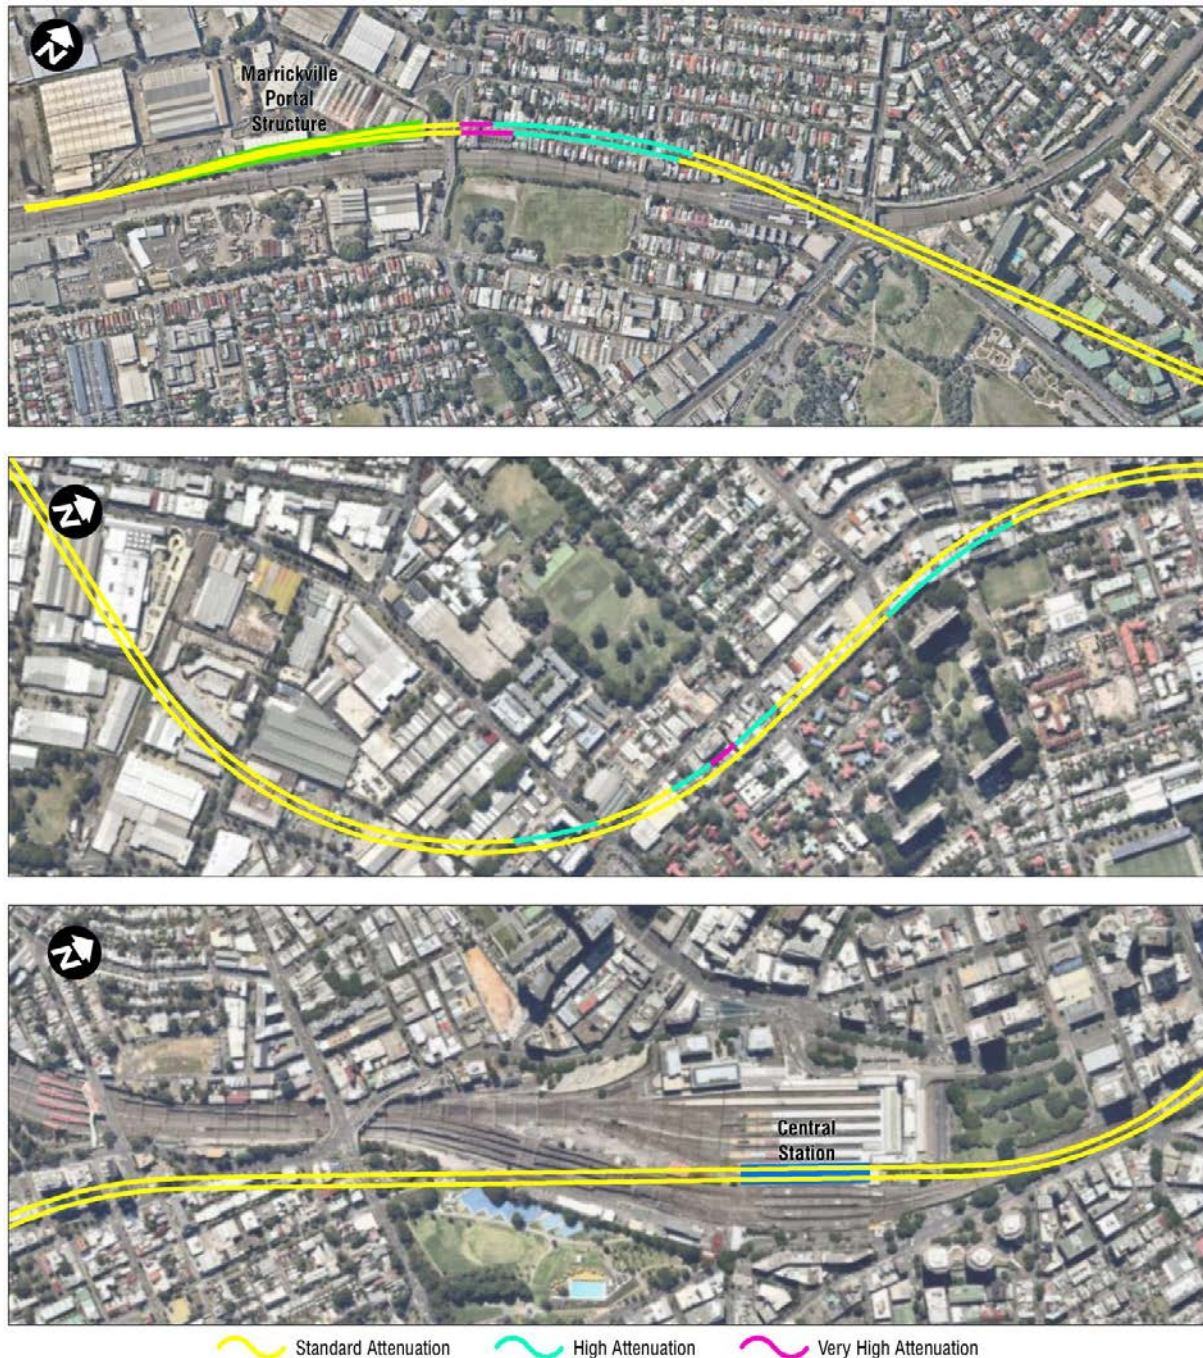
Extent of Proposed Track Forms - Marrickville Tunnel Portal to Central Station
